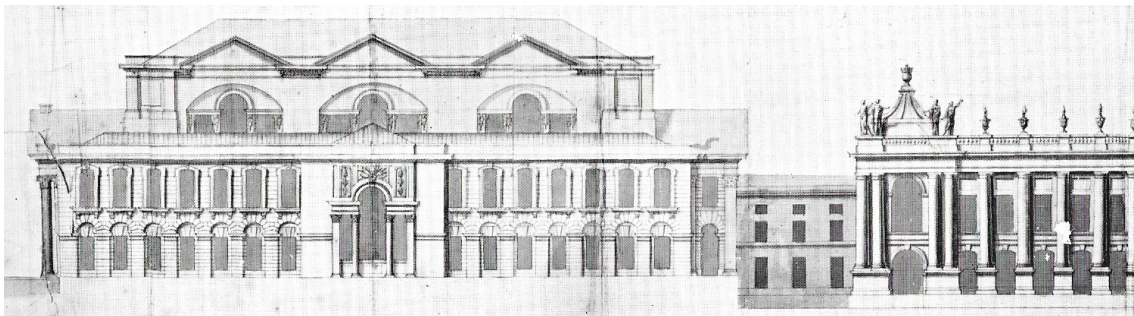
Whitehall Palace proposed Houses of Parliament, 1st great design (Image: Sekler, Eduard. *Wren and His Place in European Architecture*. London: Faber & Faber, 1956.)
